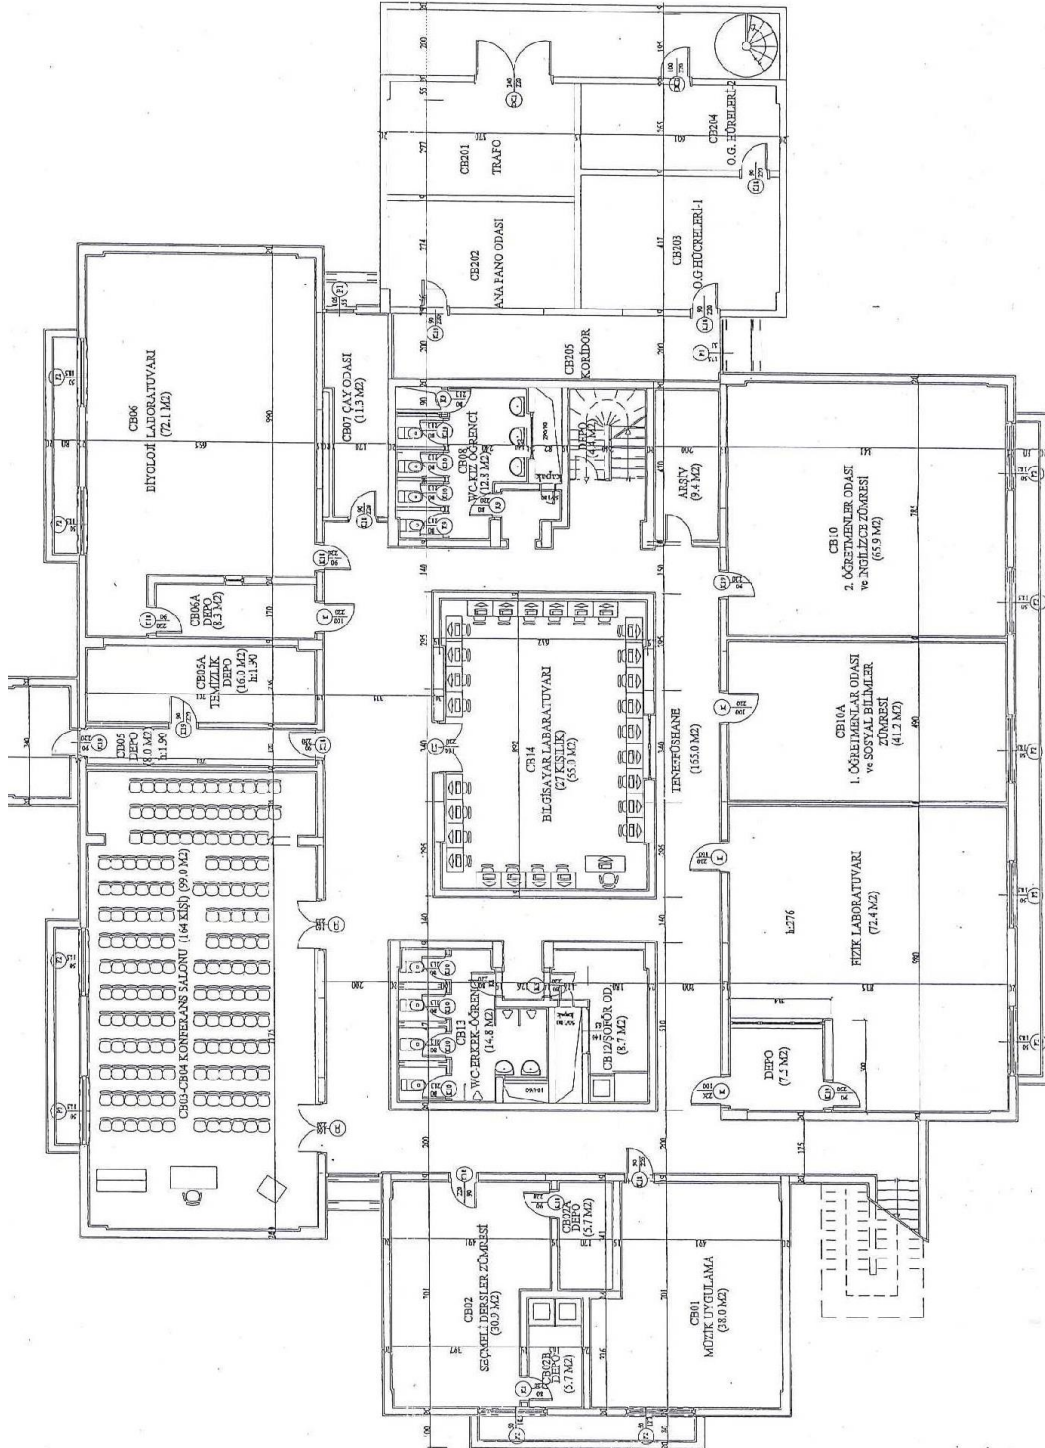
Basement floor plan of Bilkent High School (not to scale)
